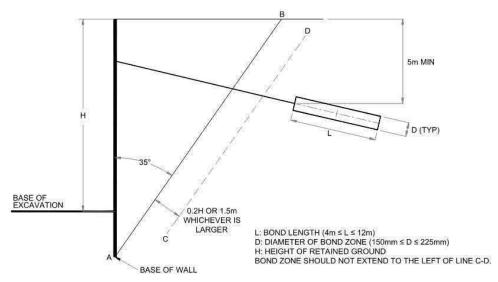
provides the recommended minimum spacing and depth of ground anchors. From a constructability point of view, anchors can be installed as long as 50 m with inclinations ranging from 10 to 35 degrees from the horizontal. Consideration should, however, be given to limiting the length of anchors (if feasible) to avoid any intrusions below the residential properties at the crest of the existing cut slopes of Terwillegar Drive and Whitemud Drive. Based on the information provided by CIMA+, it is estimated that the property limits are located approximately 13 to 22 m behind the face of Retaining Wall 1 and approximately 33 to 42 m behind the face of Retaining Wall 2.
